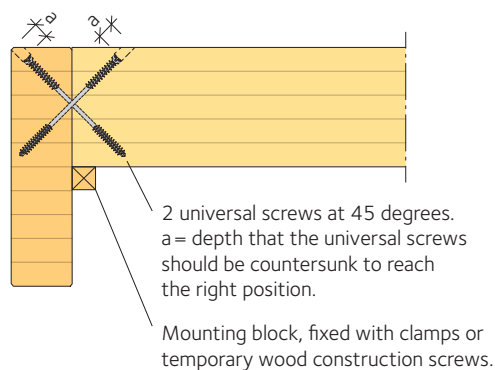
Example of fixing a glulam floor joist to a glulam binder with a wood screw joint
